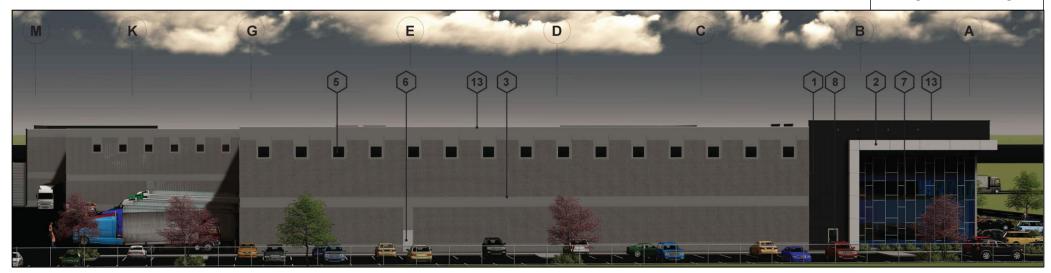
Proposed West Elevation (Battaglia Architect Inc., March 2021)
